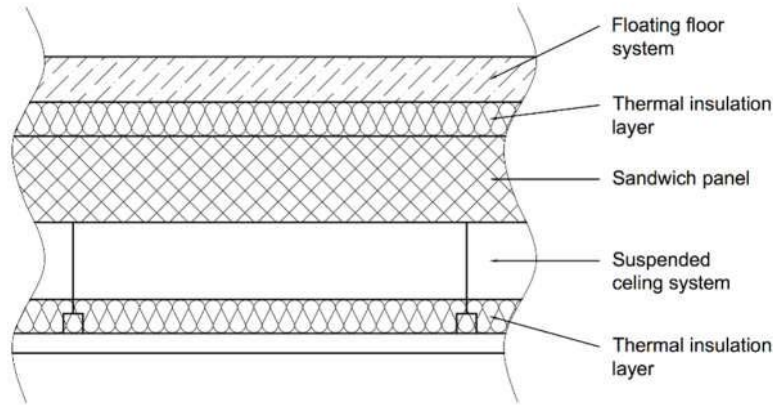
Constructive detail of the sandwich panel floor with suspended ceiling and floating systems and thermal insulation layers
